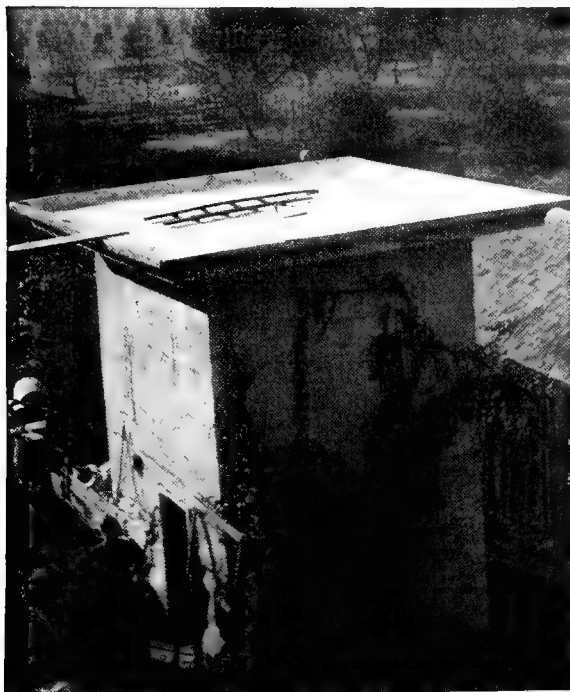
Concrete Dairy House and Water Tank of Joseph E. Wing, Mechanicsburg, Ohio, showing the flat slab concrete roof with ornamental cornice.
